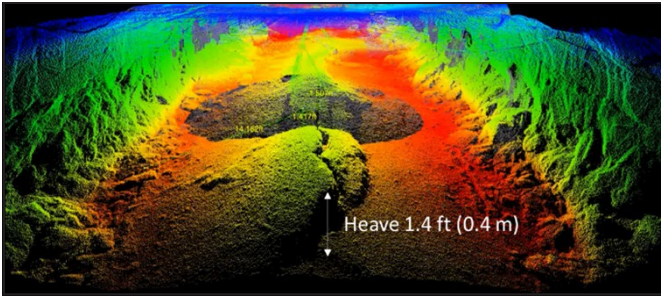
Floor heave profile from LiDAR scan in Entry 2H ~400 ft (121.6 m) outby the face
